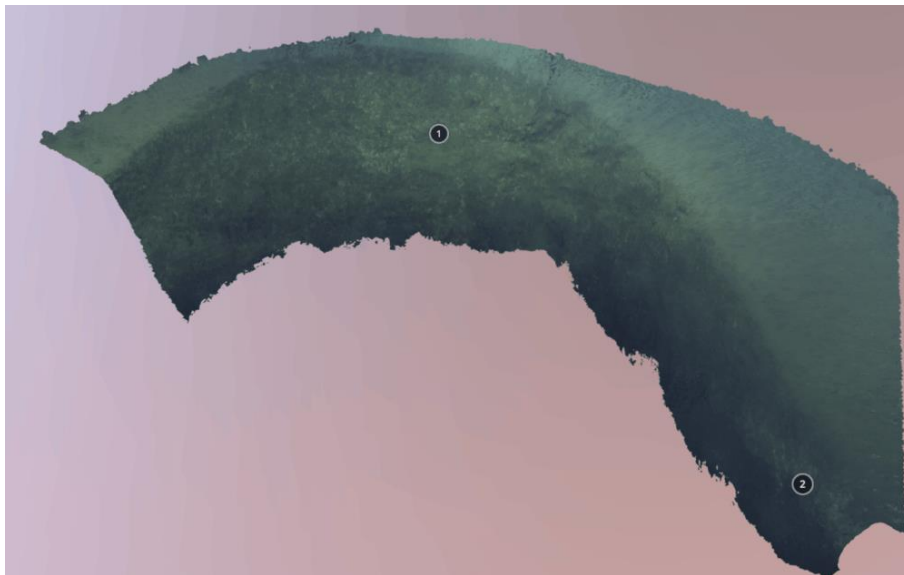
Visual 3D model of embankment inlet headwall ([click here](#) or on the image above to launch).
